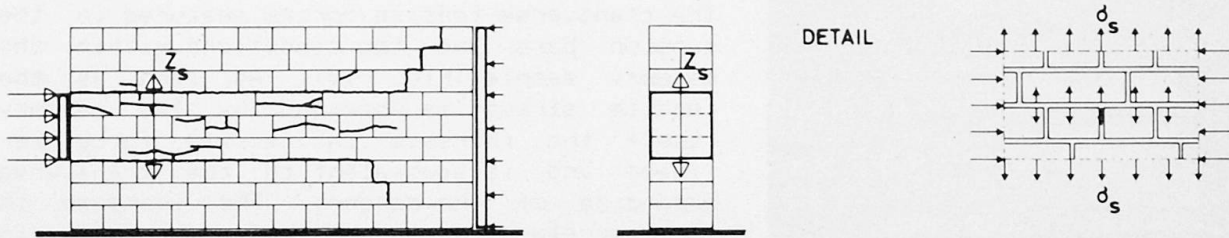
splitting tensile forces perpendicular to the horizontal joints
